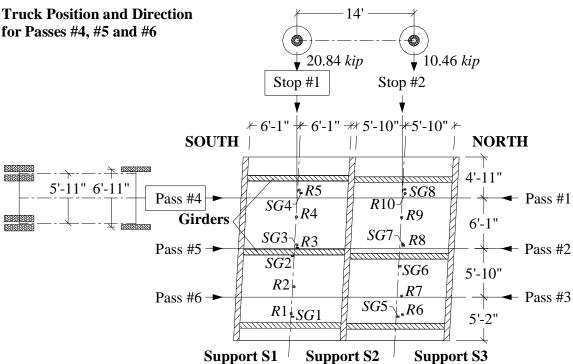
Legal Truck Used in the Load Test after Strengthening
